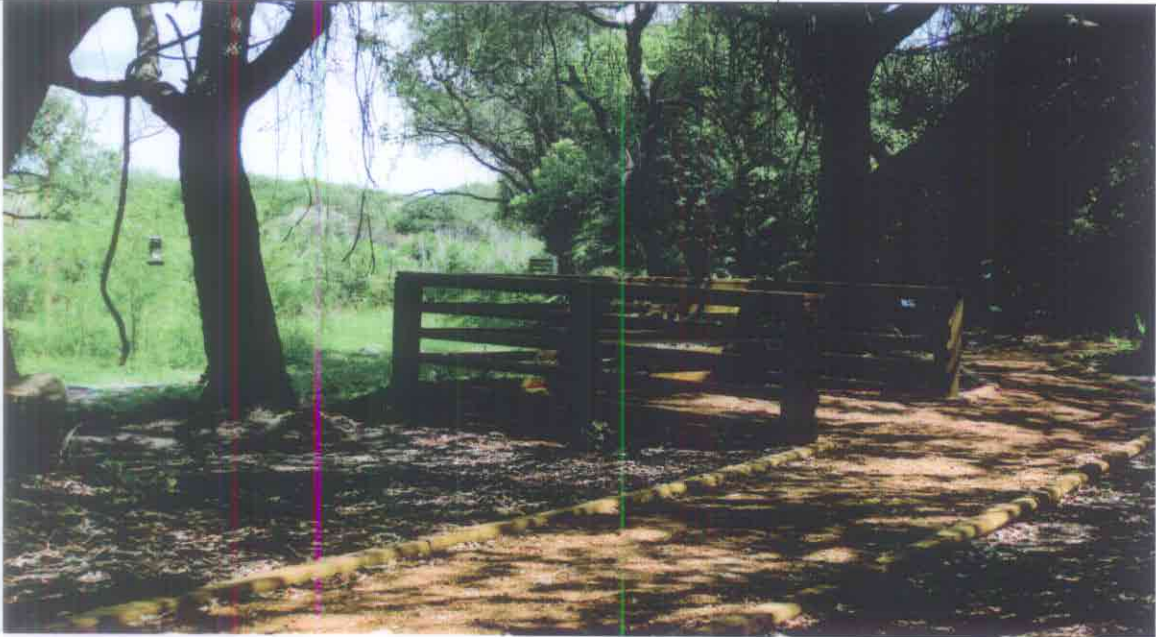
One of the two viewing "bulbouts" constructed along the trail overlooking W. Seep Pond on Live Oak Ridge.
